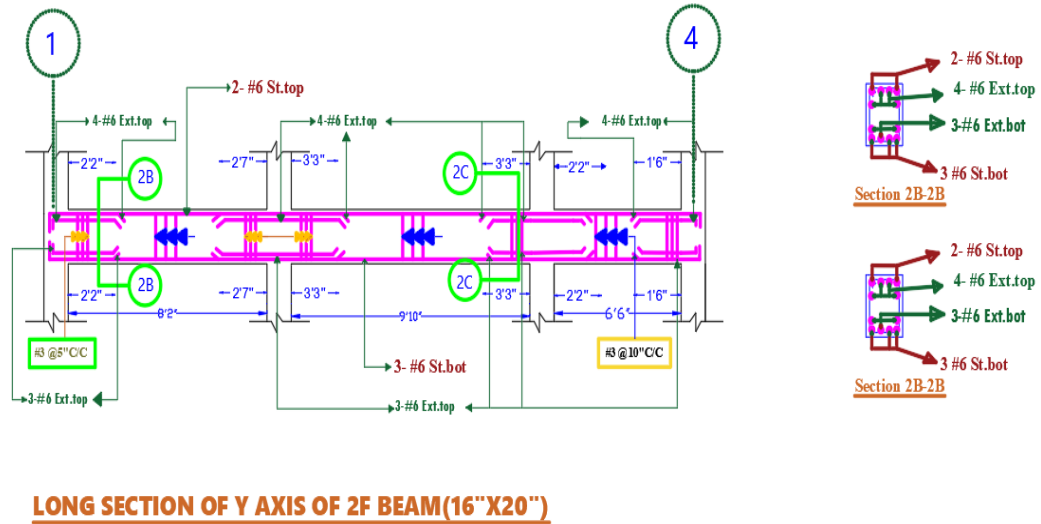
Long and Cross Sections of Y Axis of 2<sup>ND</sup> Floor Beam (16" X 20")
